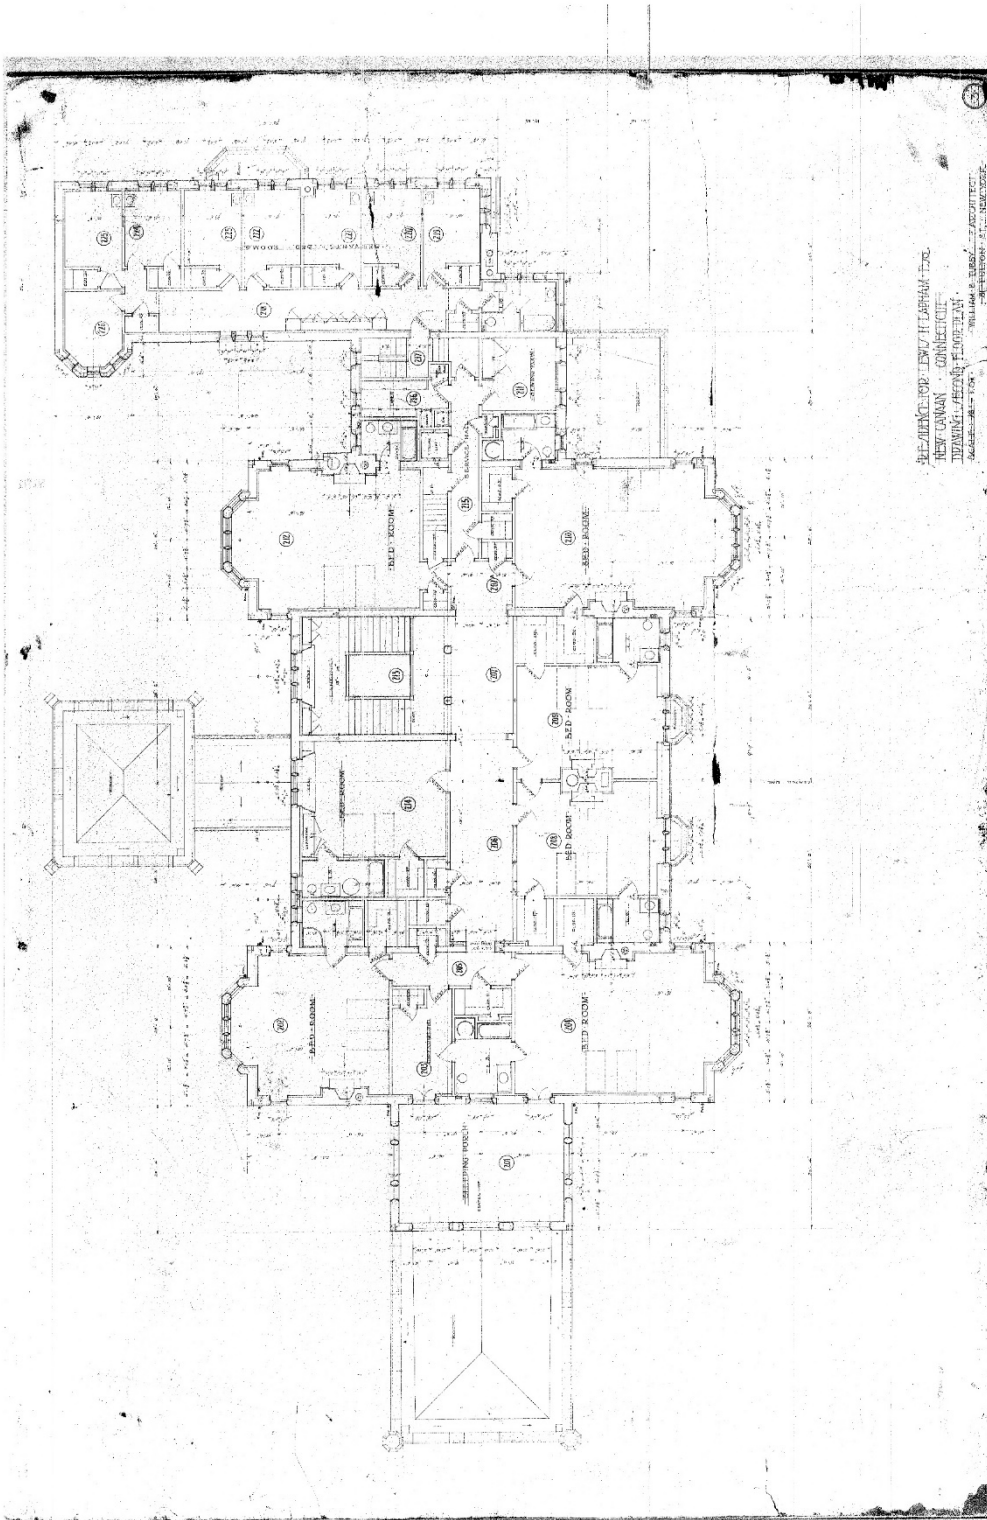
Second floor plan of Waveny House (New Canaan Department of Public Works, New Canaan, CT).
